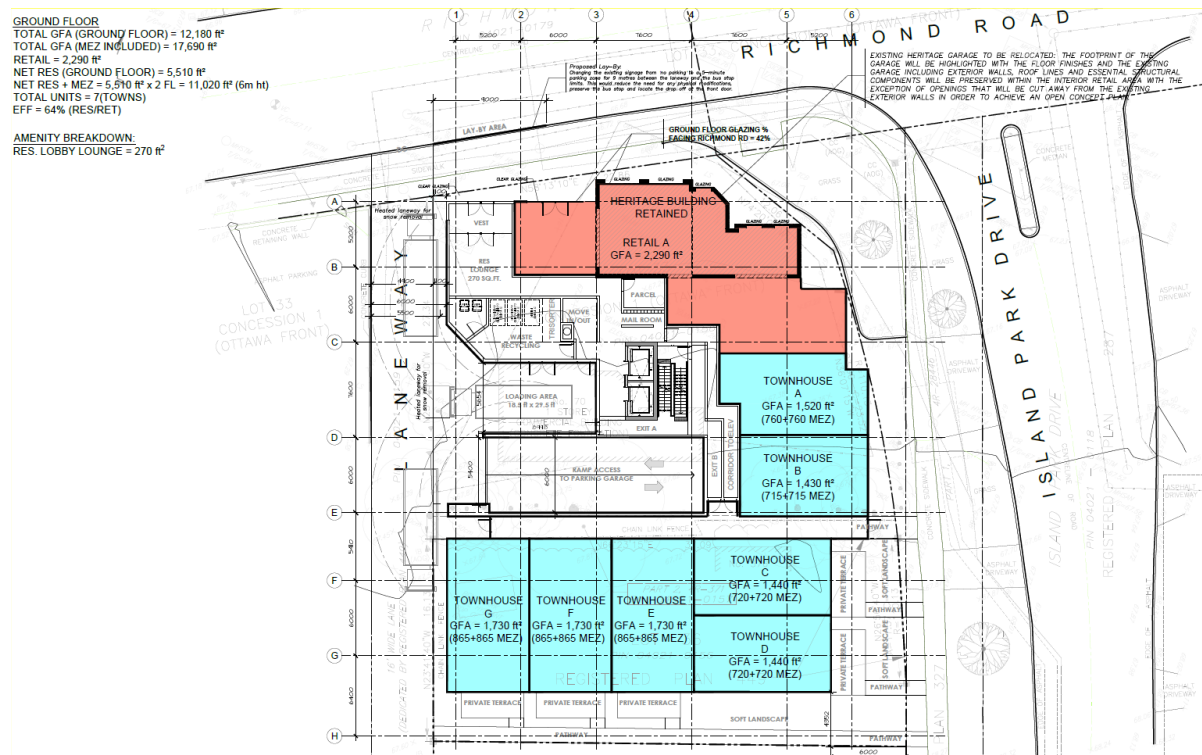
Ground Floor layout showing the extent of retail in pink and purple. The townhouse units (turquoise). Source: Hobin Architecture 2022.
